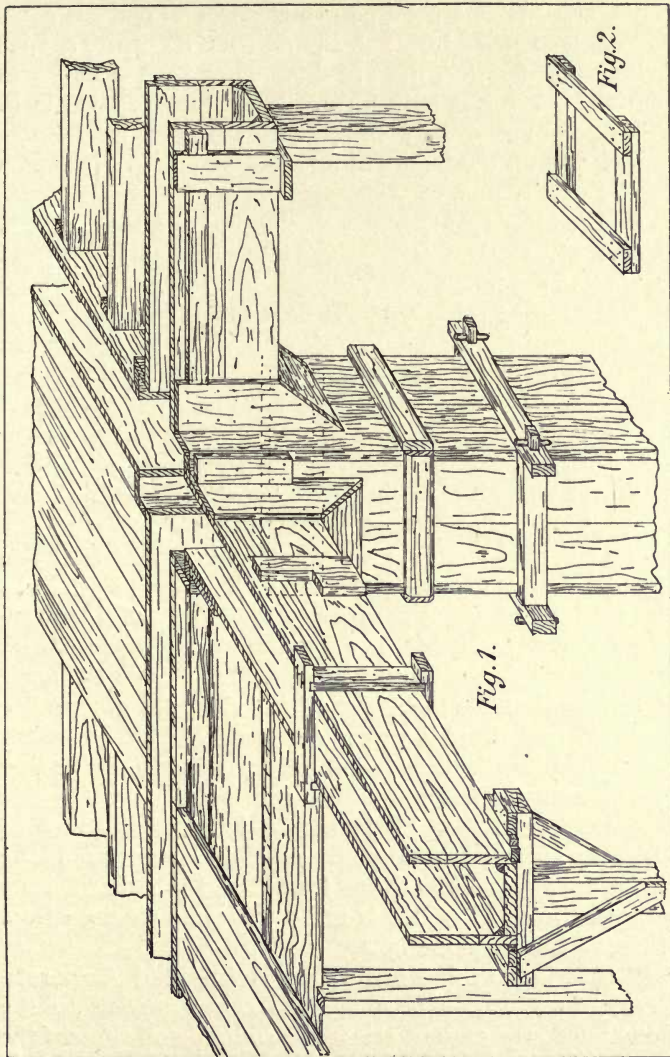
Shuttering and Forms for Reinforced Concrete Work. Fig. 2. A Light Clamping Frame
